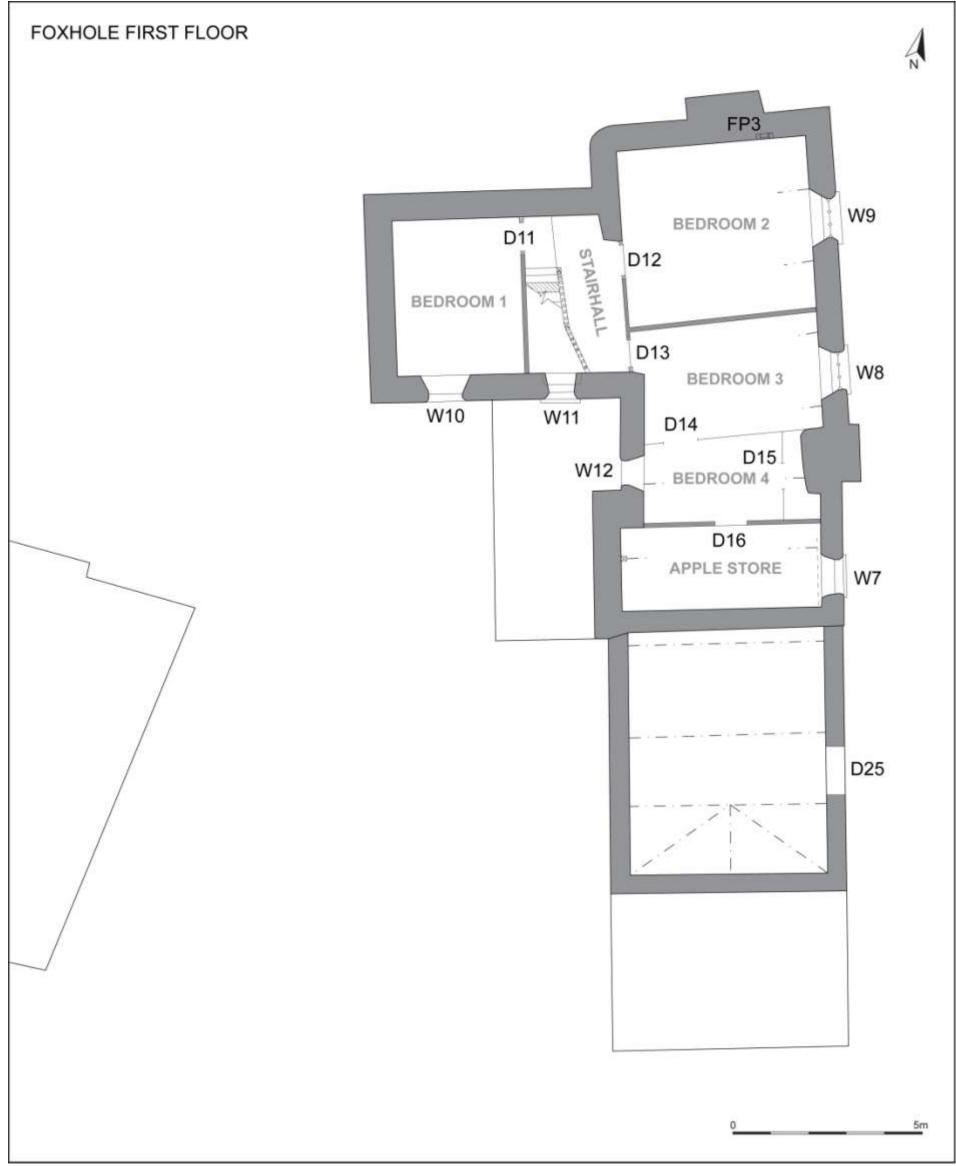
FIRST FLOOR PLAN SHOWING DOOR (DX), WINDOW (WX) AND FIREPLACE (FPX) NUMBERS.
